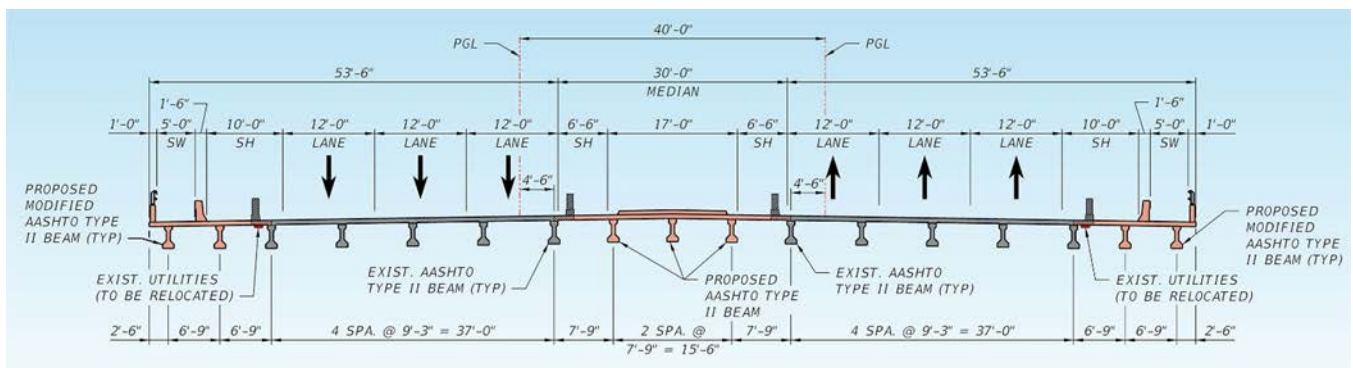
Proposed Bridge Typical Section over CSX S-Line
